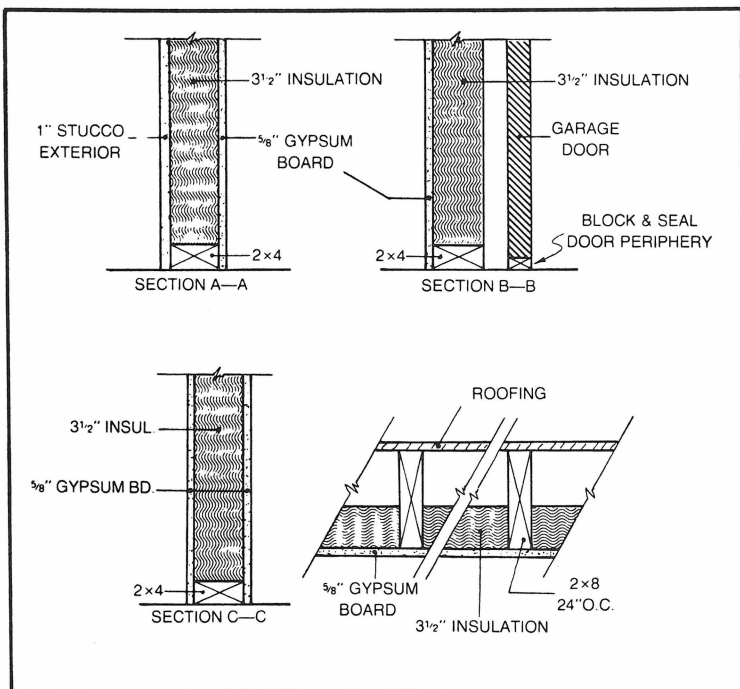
Wall construction details in converted garage studio. Sections refer to Fig. 7-2.
